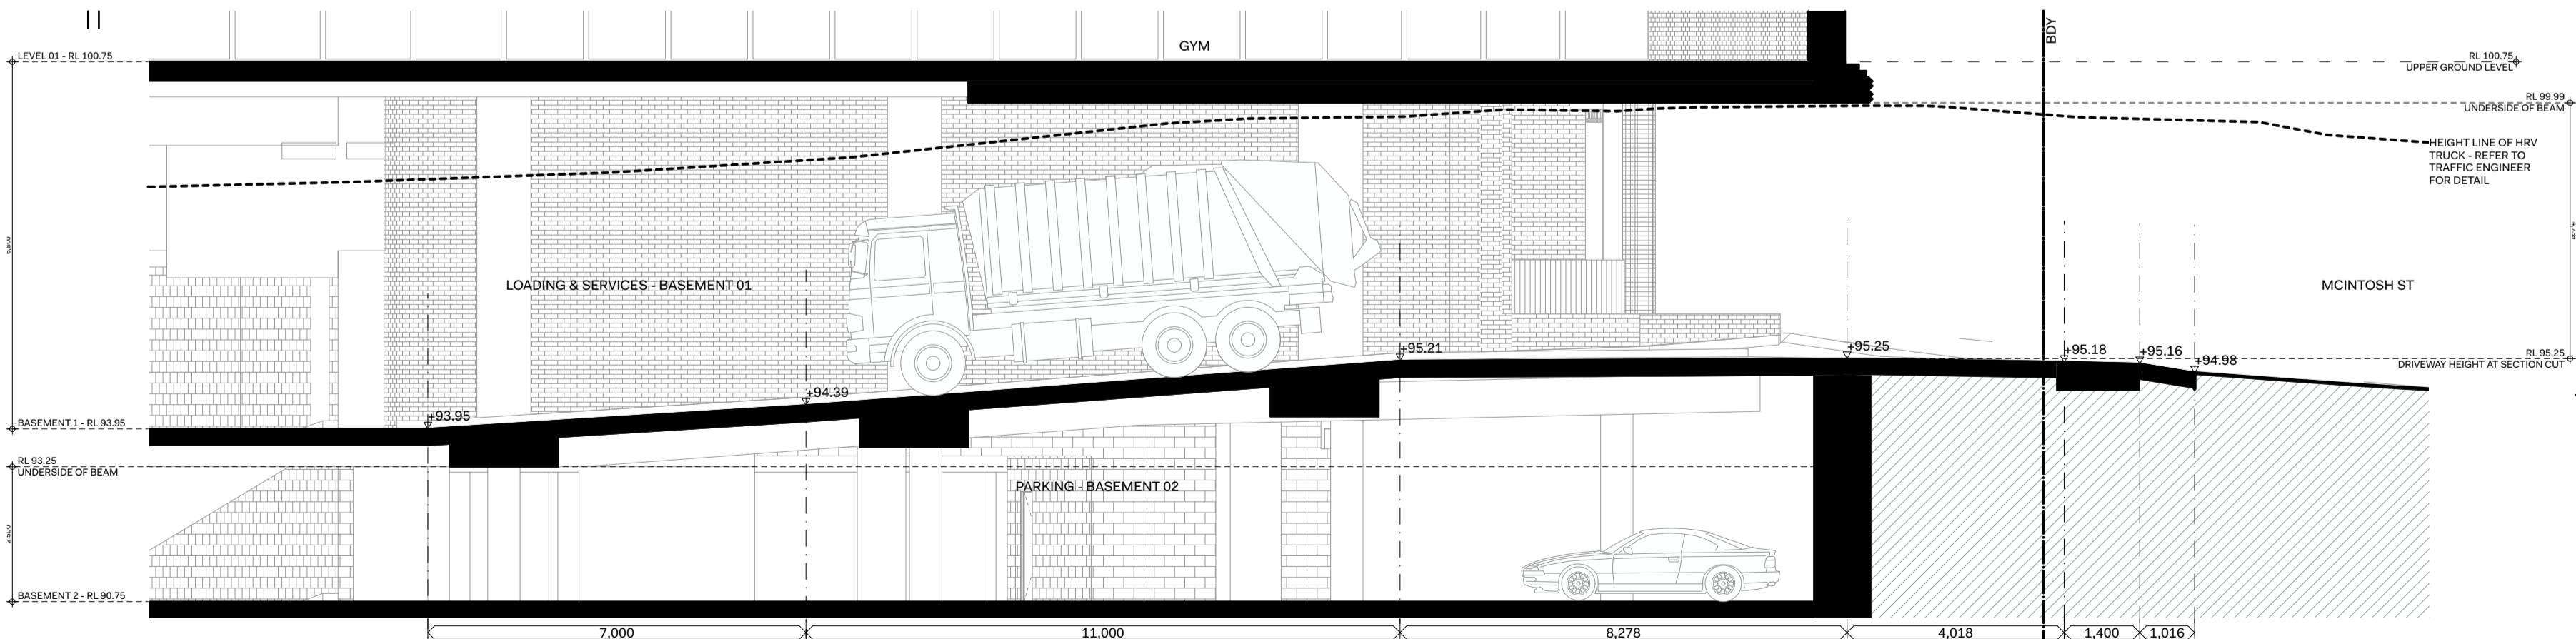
DETAIL PLAN - DRIVEWAY - MCINTOSH STREET
